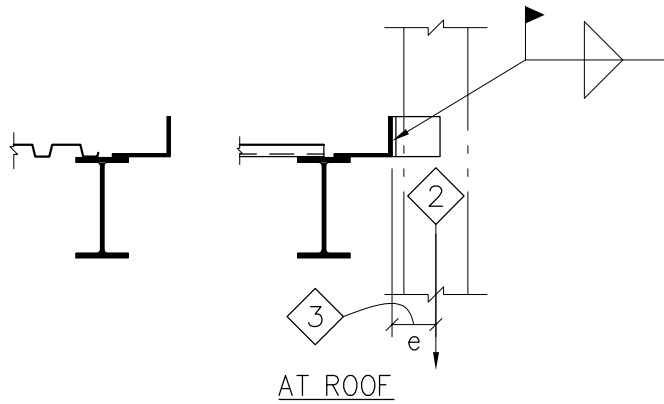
METAL STUD CONSTRUCTION ISSUES - CASE C: STRIP WINDOW PANELS
